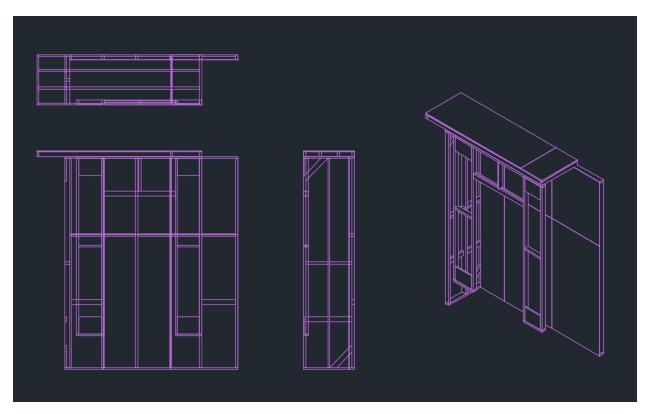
UGC Tower Platform Support Drafting, Orthographic and Isometric Views - Modelspace
